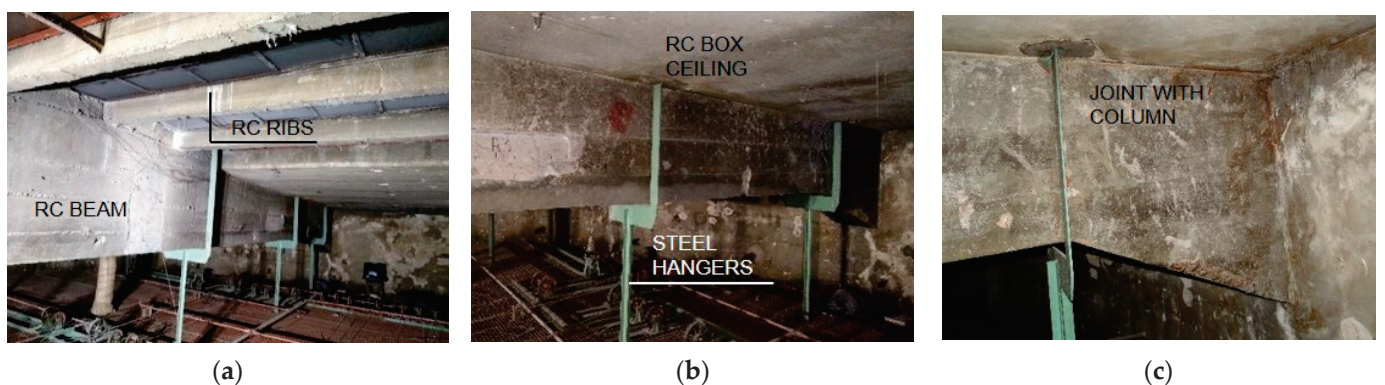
View of the beams: (a) at the skylight location; (b) near the column support; (c) connection to the column.
